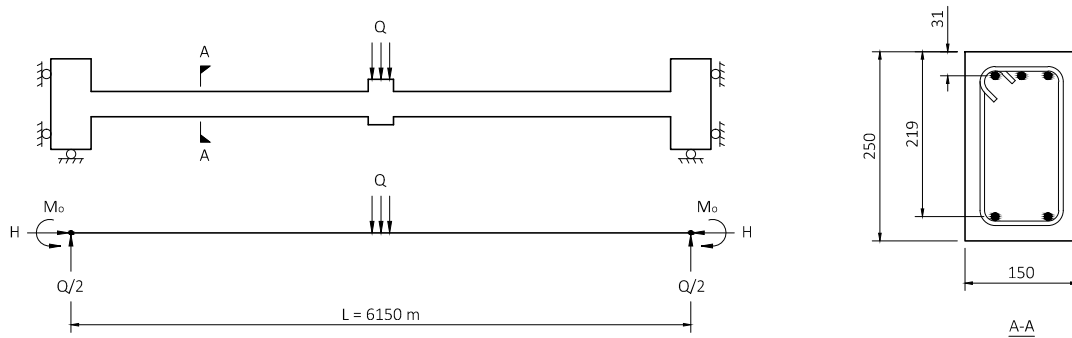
Typical beam layout and section, adapted from Yu (2013).
